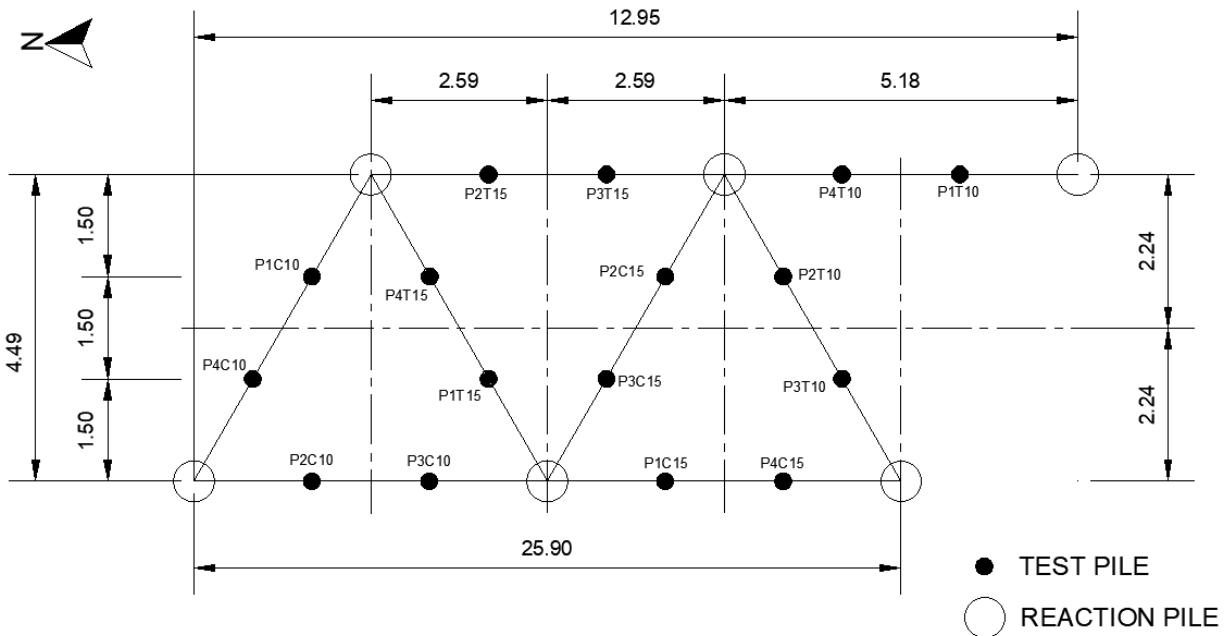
Pile Layout at the University Farm. Unit in meters (CPT is out of Pile Layout map)
